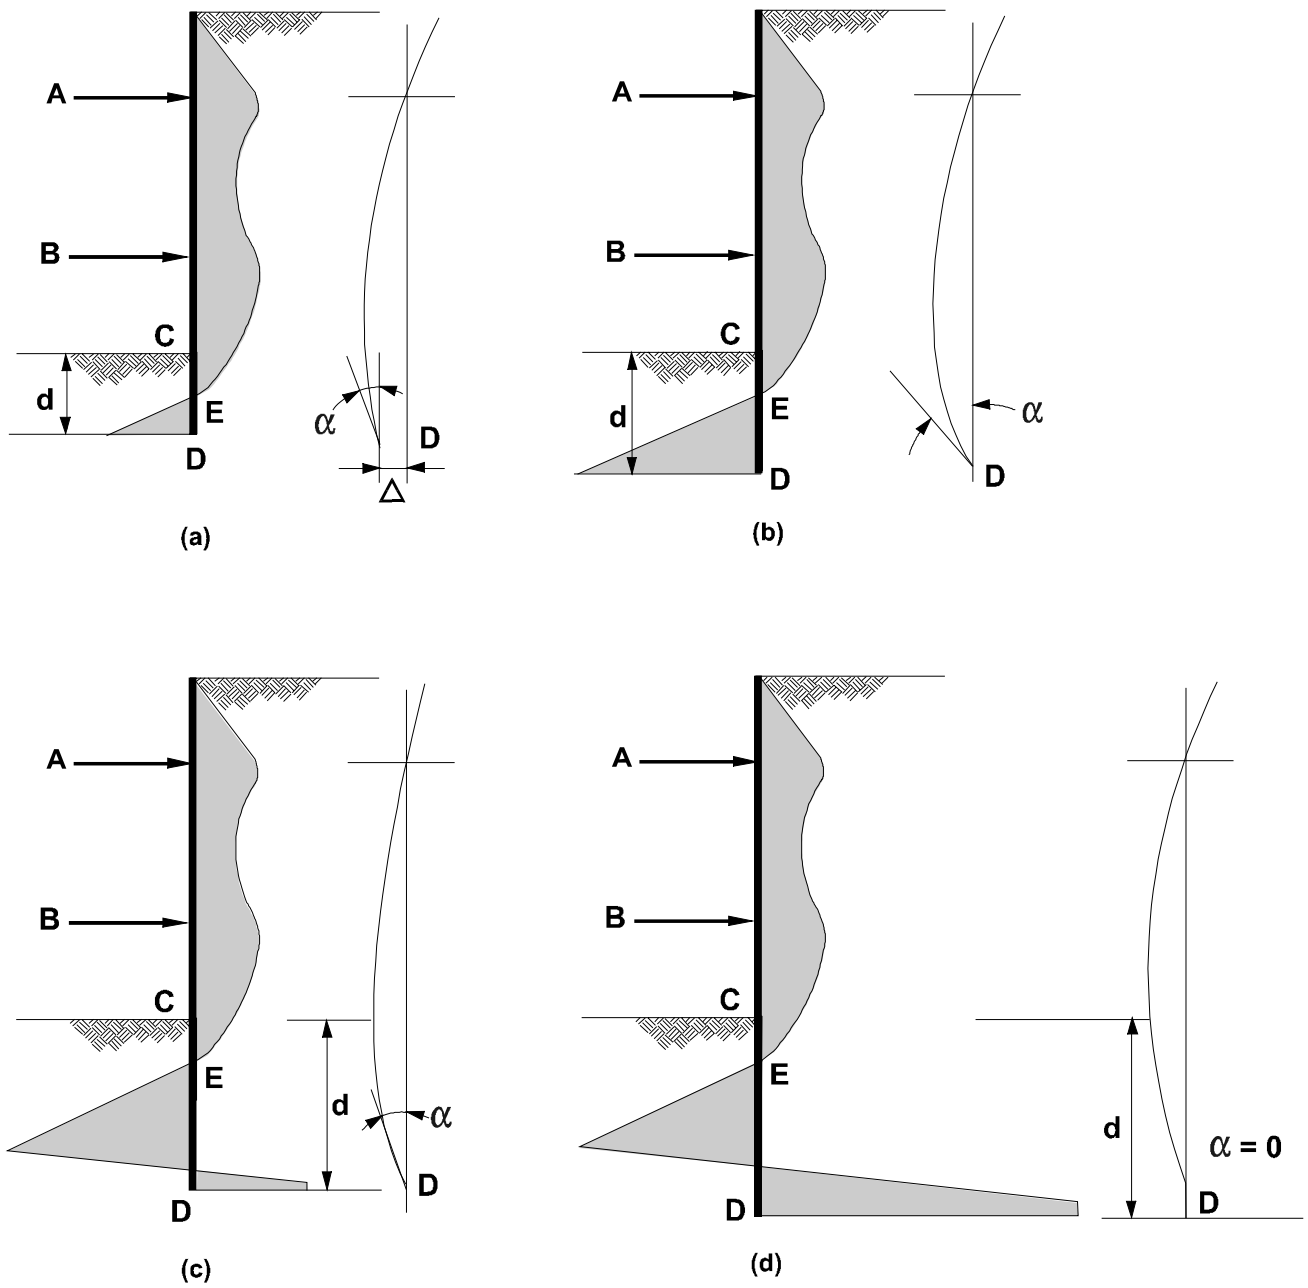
Relationship between lateral earth pressure, wall deflection, and depth of wall embedment.
